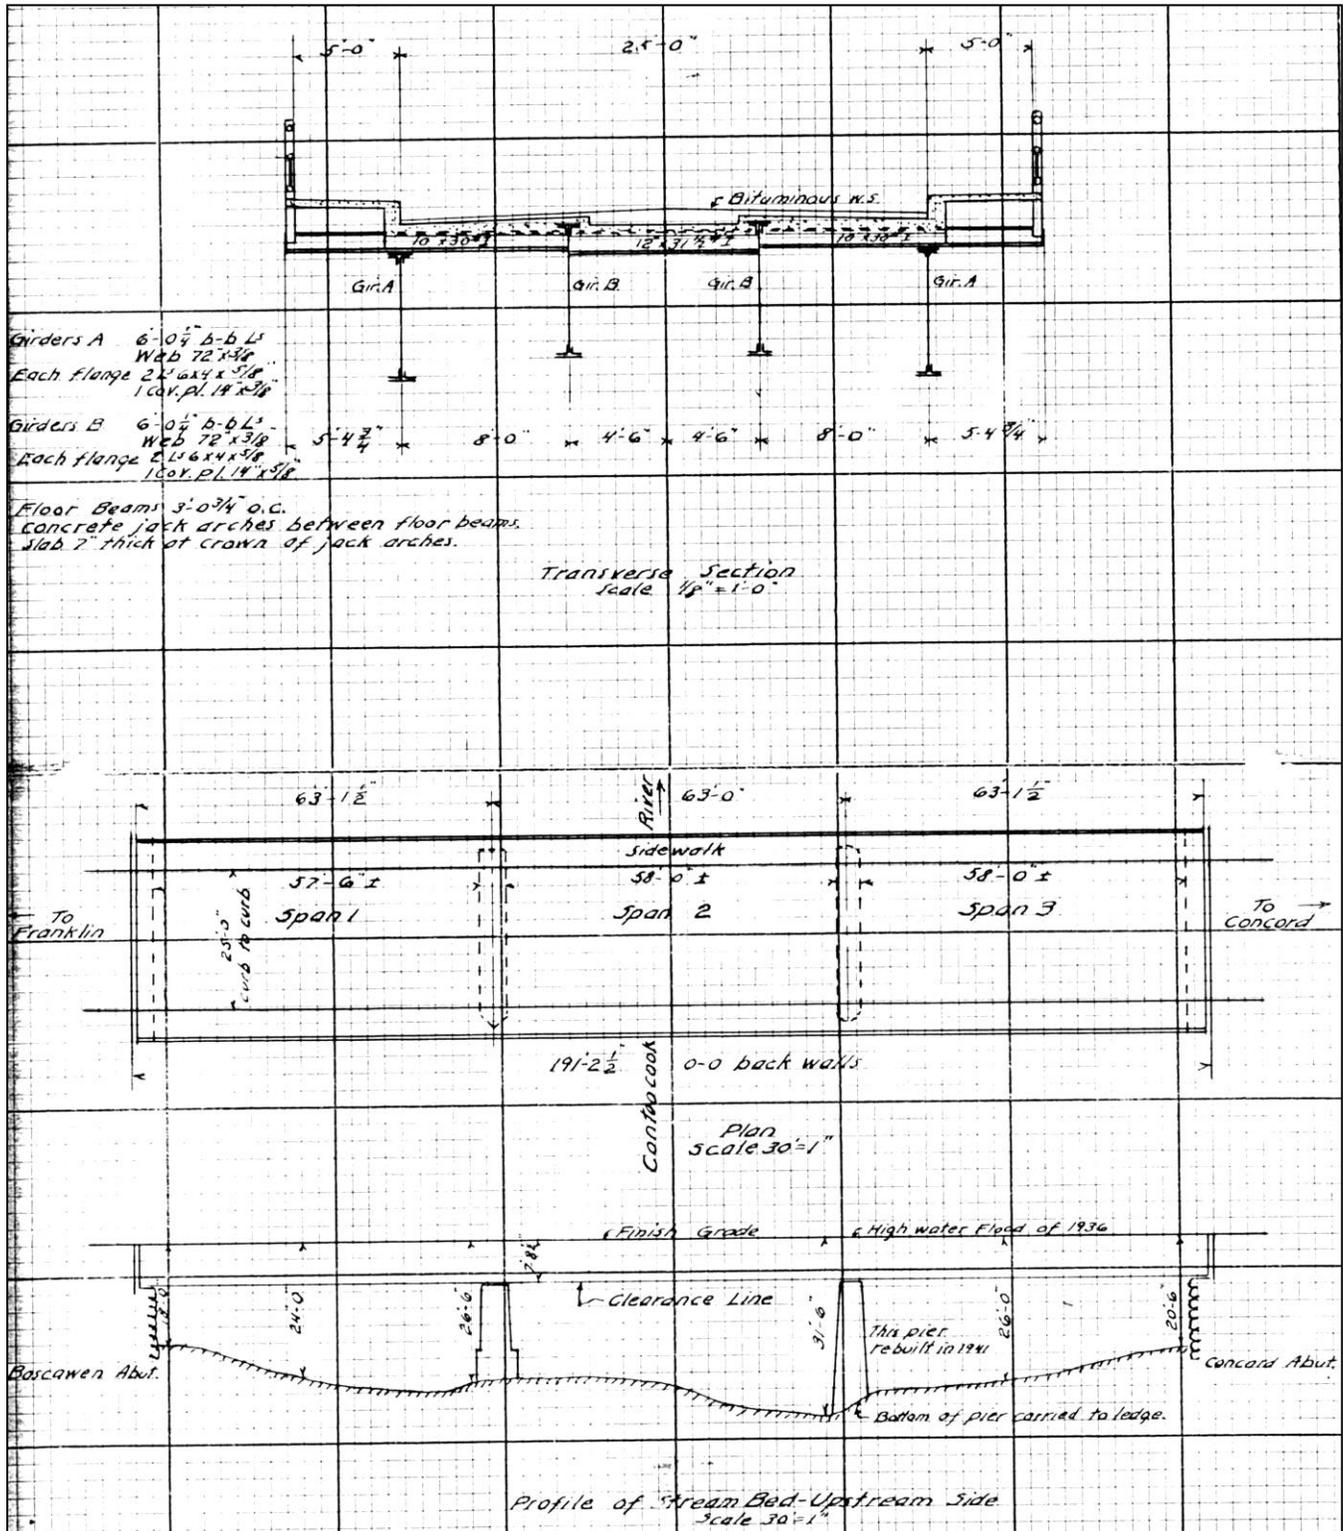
Main Street Bridge Penacook, (1915). Plan, elevation and section sketch of the three span deck plate girder bridge made by NHD engineer Wendell H. Piper, June 12, 1940 (NHD Bridge Inventory Card).
